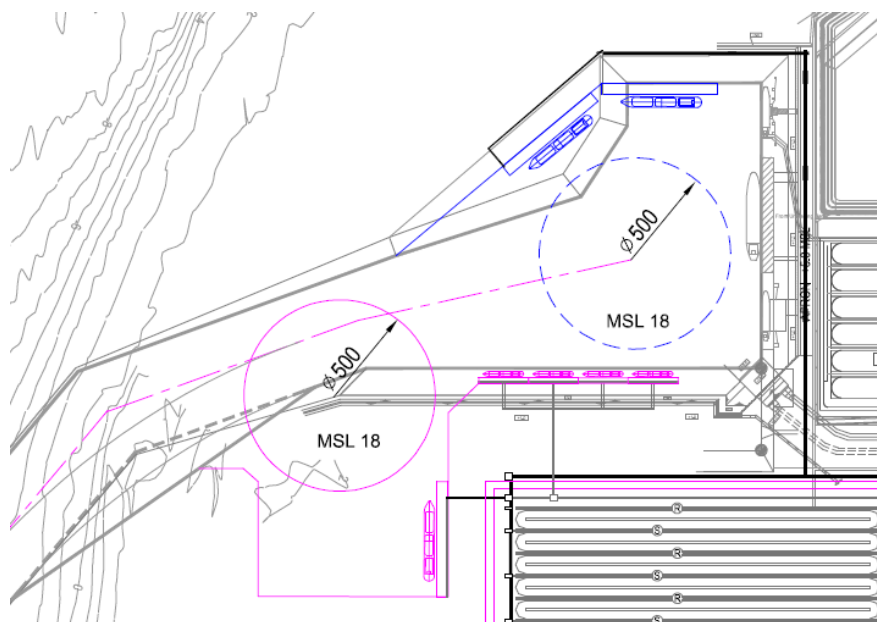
Alternative Layout Plan of Coal Unloading Berth in the 2nd Phase
